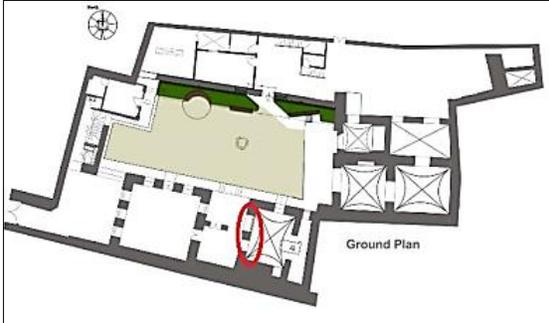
Shows a plan of the ground floor of Yakan's house and the location of the murals paintings.
